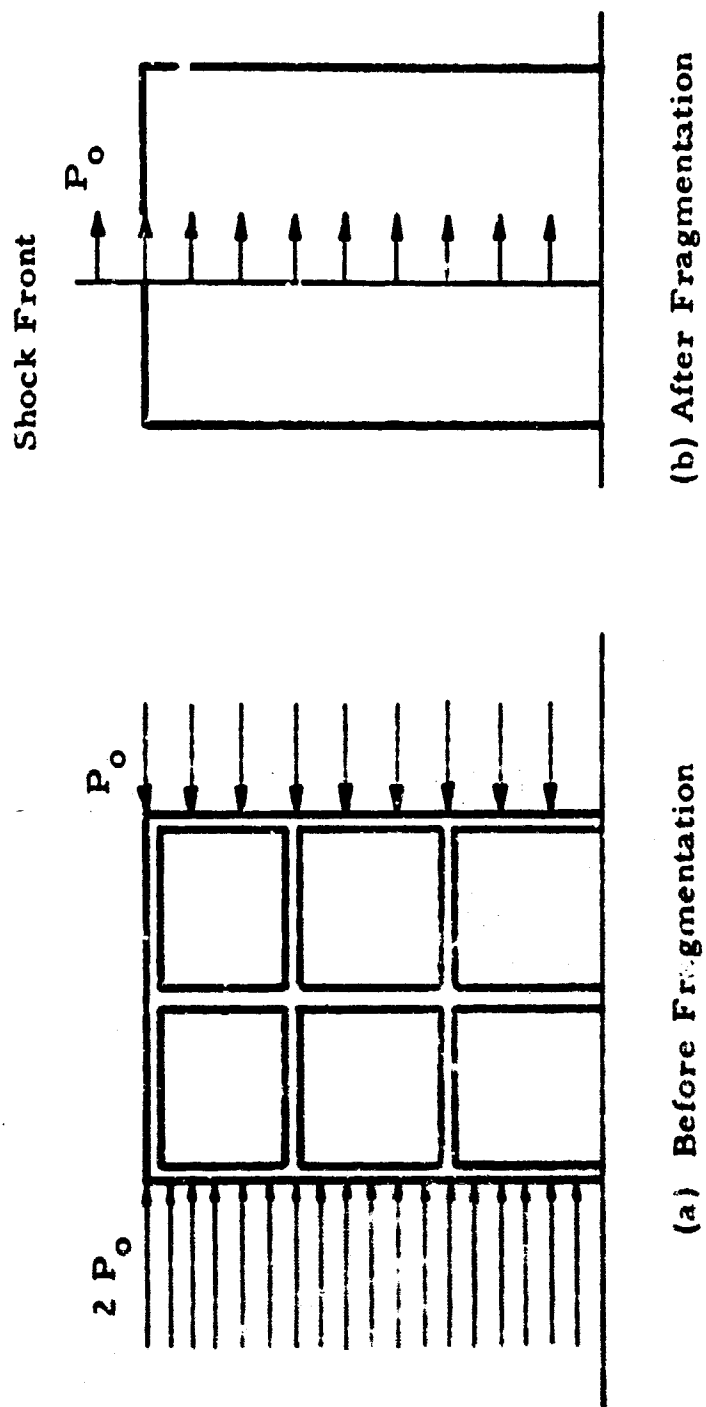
LOADING ON WALLS PARALLEL TO SHOCK FRONT
